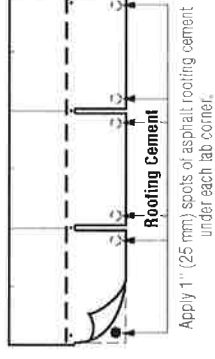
Use four nails and six spots of asphalt cement on steep slopes. *CAUTION: Excessive use of roofing cement can cause shingles to blister.
